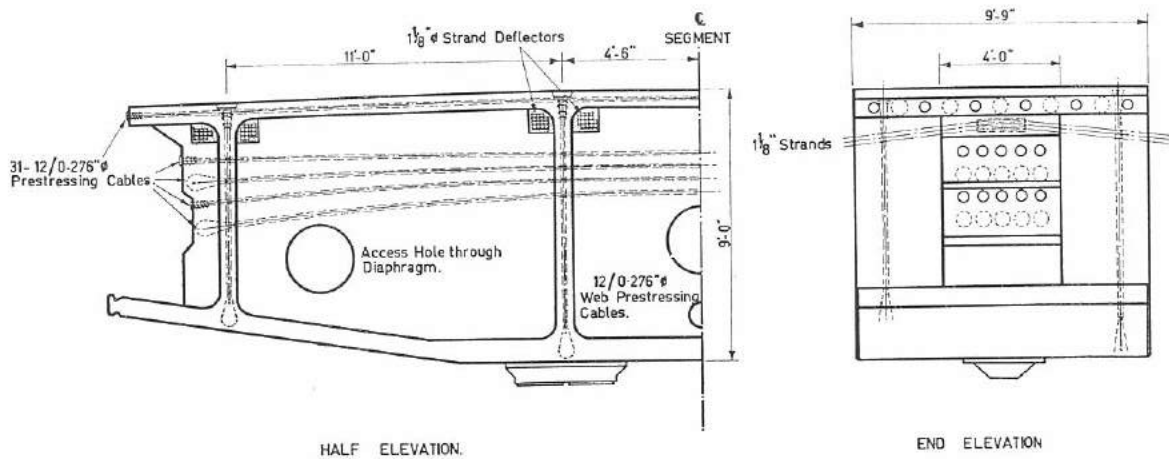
Commonwealth Avenue Bridge—Transverse Pier Diaphragm.
